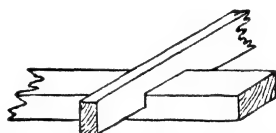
Joists notched out to Wall Plates, ends left on full depth.
